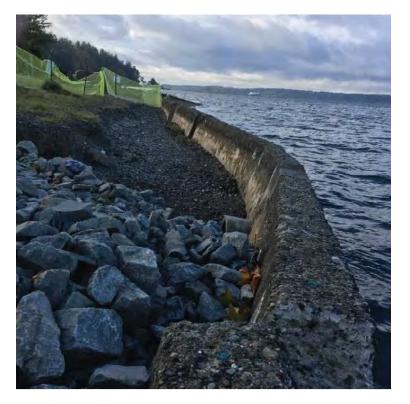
Southern View from Zone B-C. *Source: Reid Middleton Site Visit 10/18/2016
